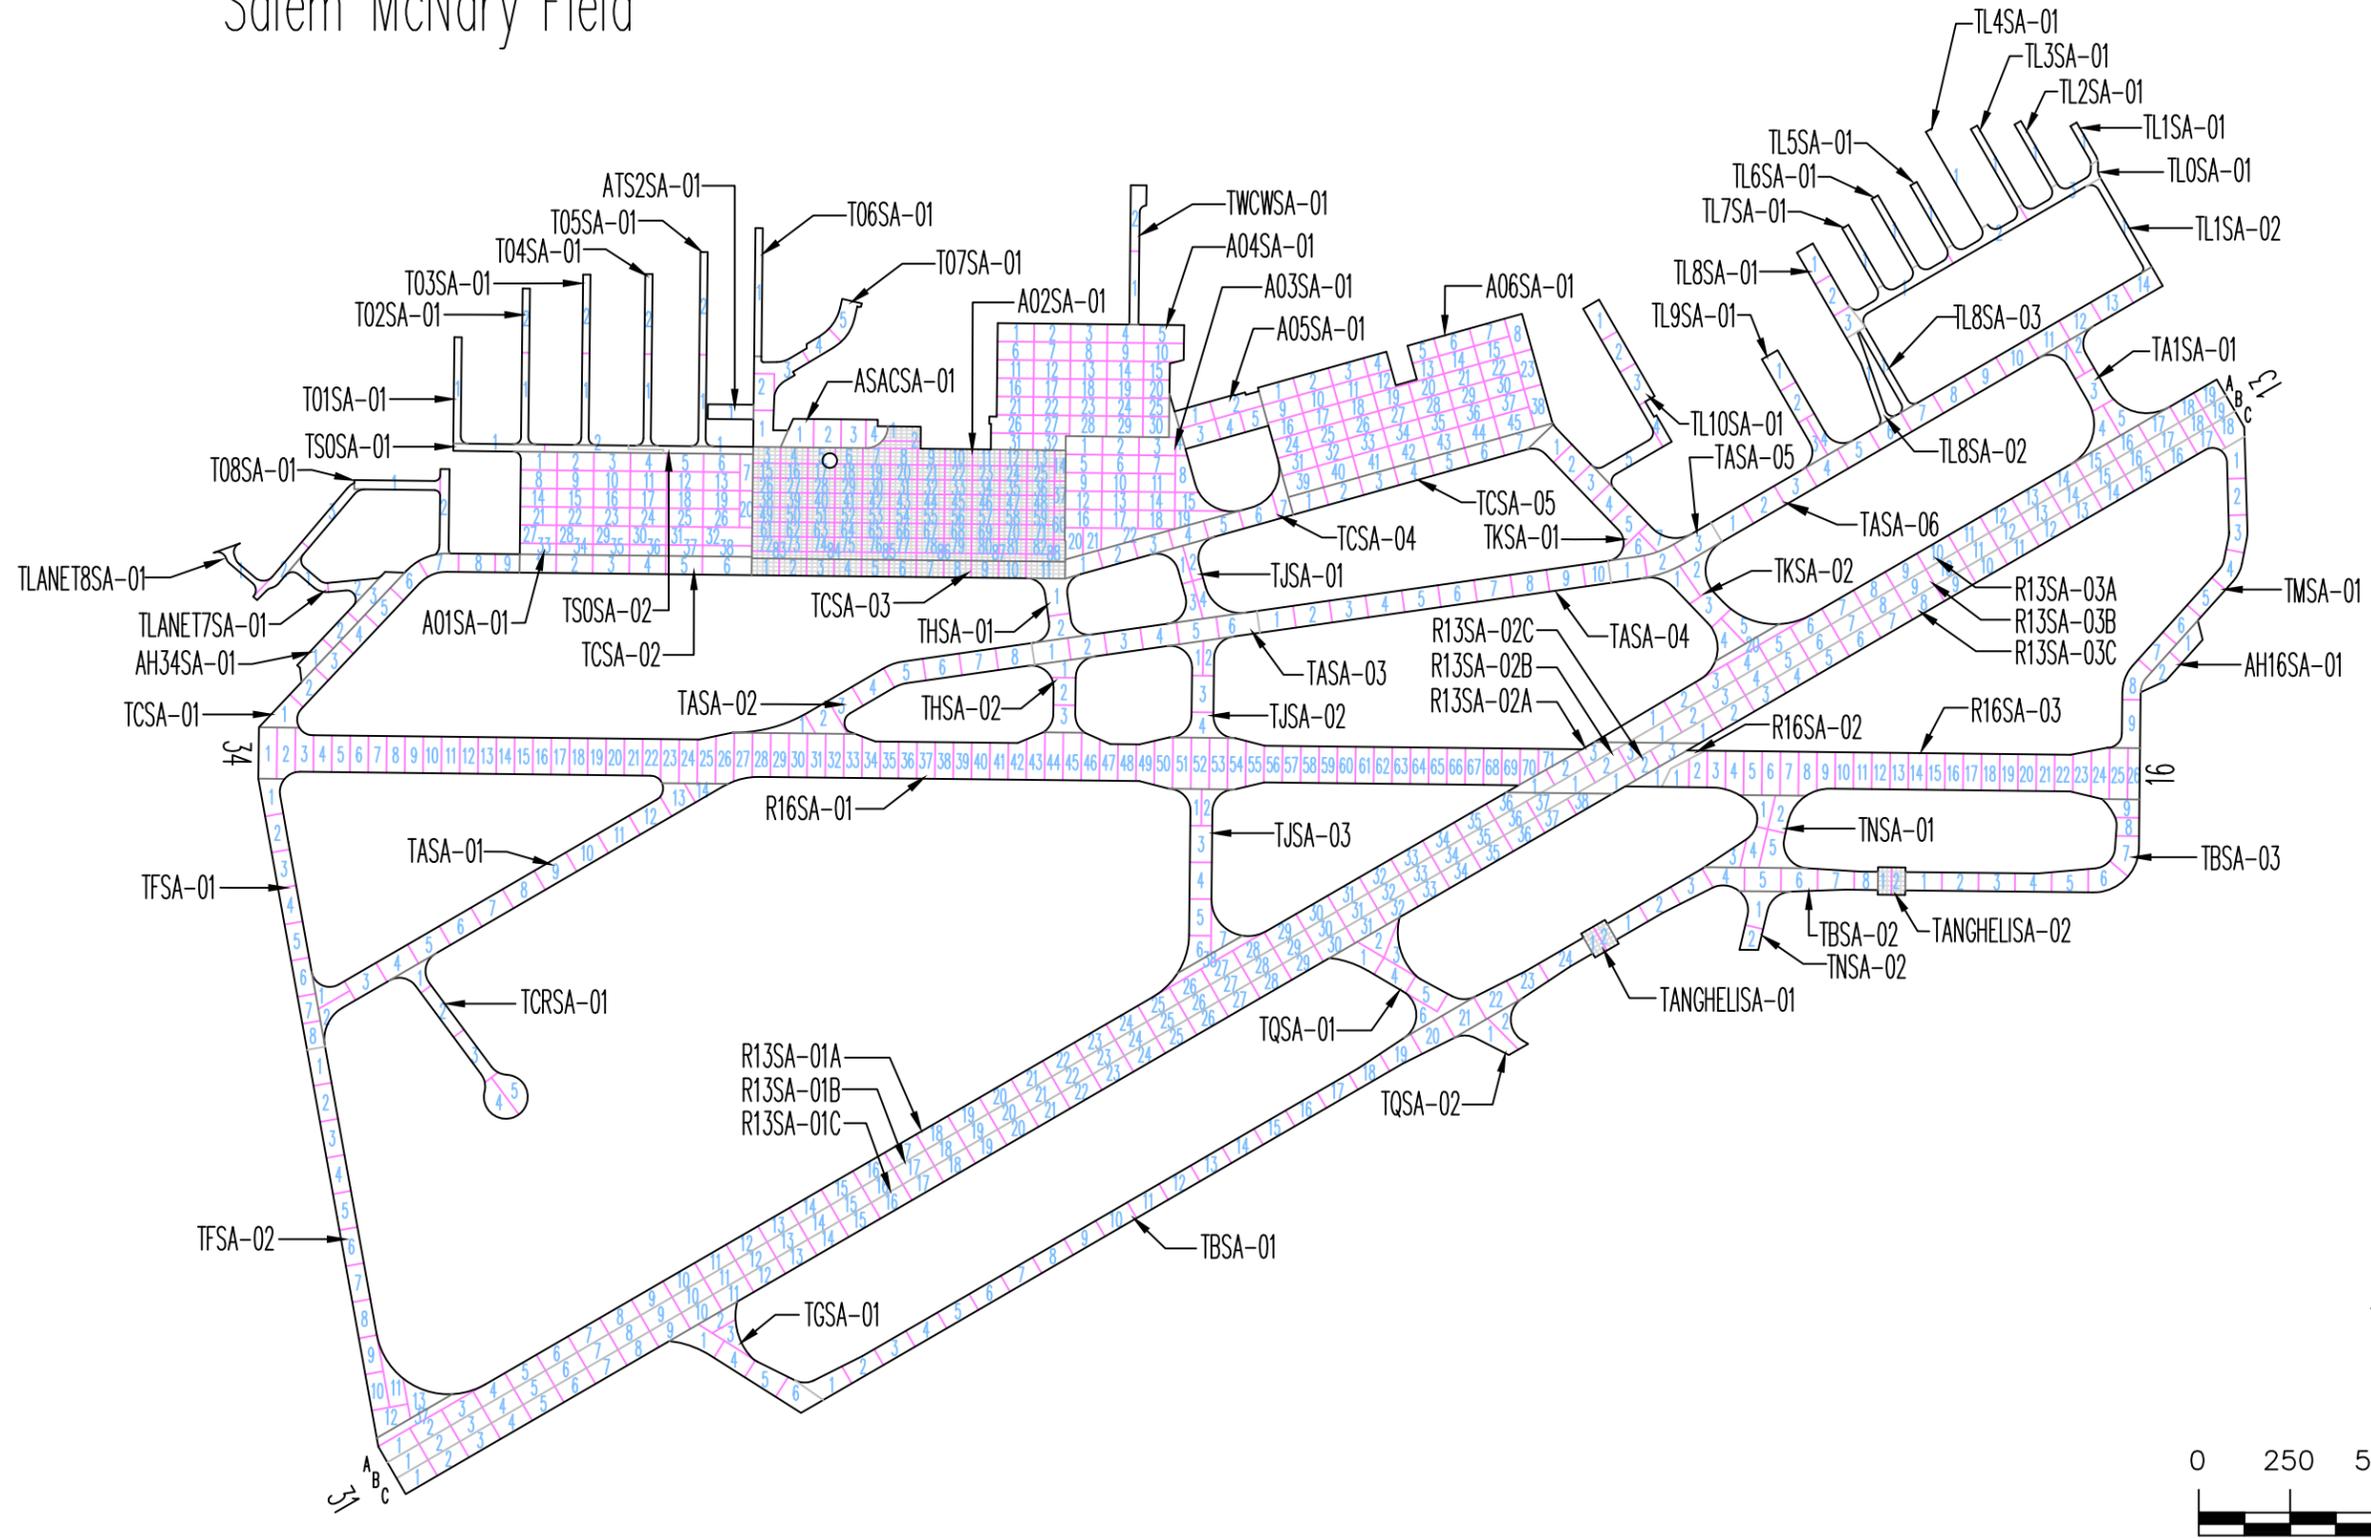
C. Airport Layout, Dimensions and Pavement Cross-Sections – Aprons and Hangar Areas.
